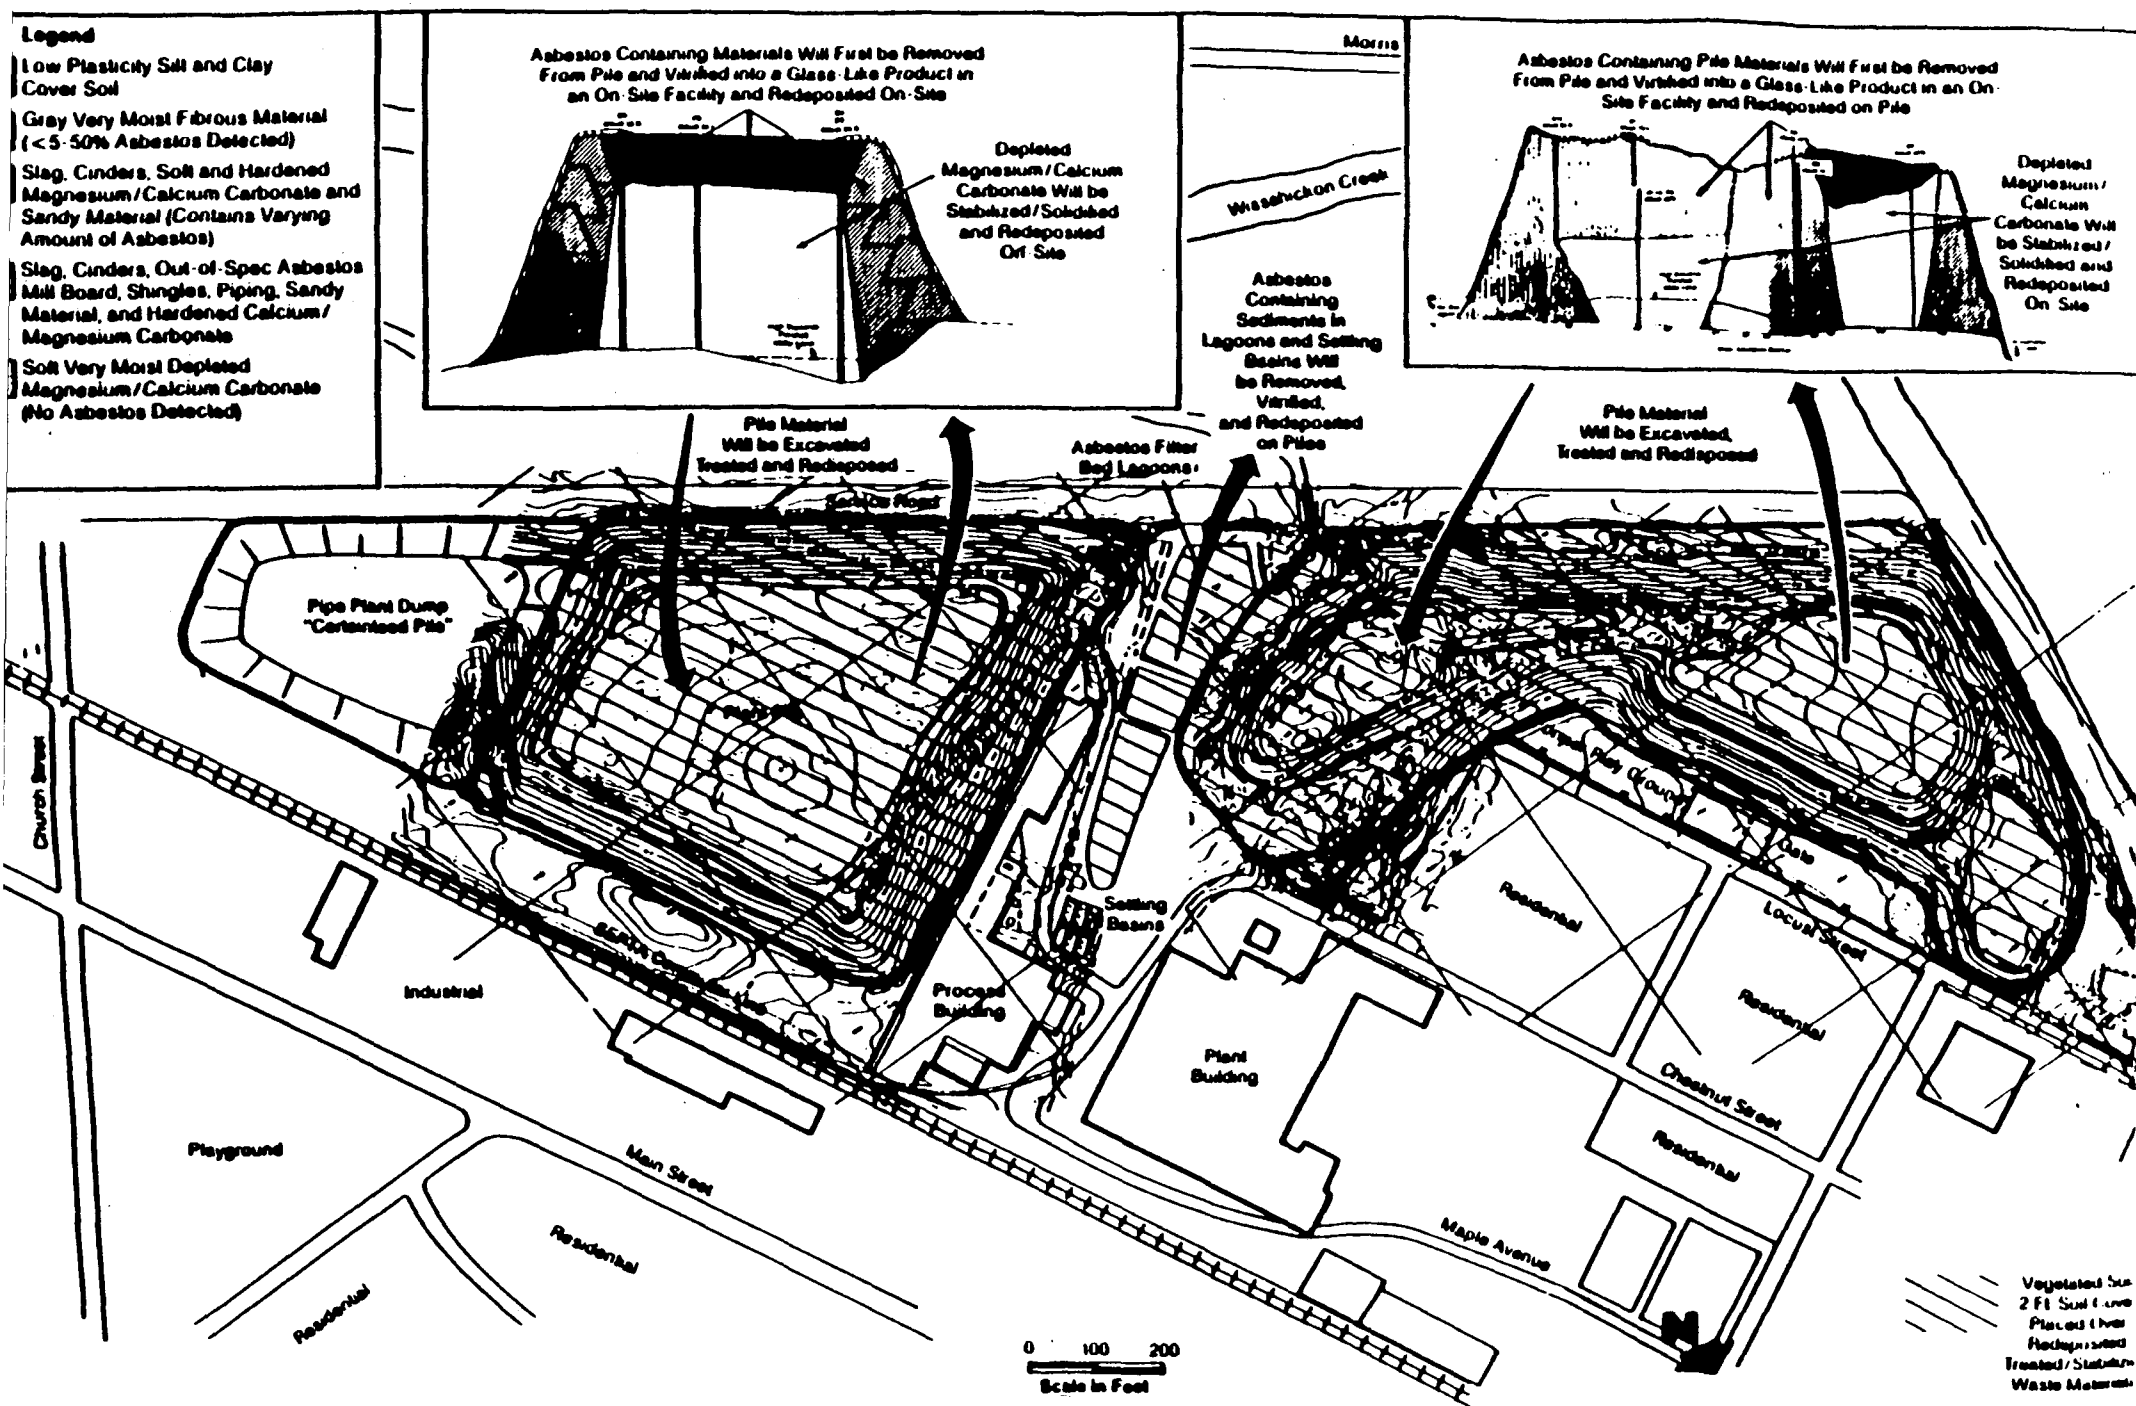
ALTERNATIVE 3 - ON-SITE
